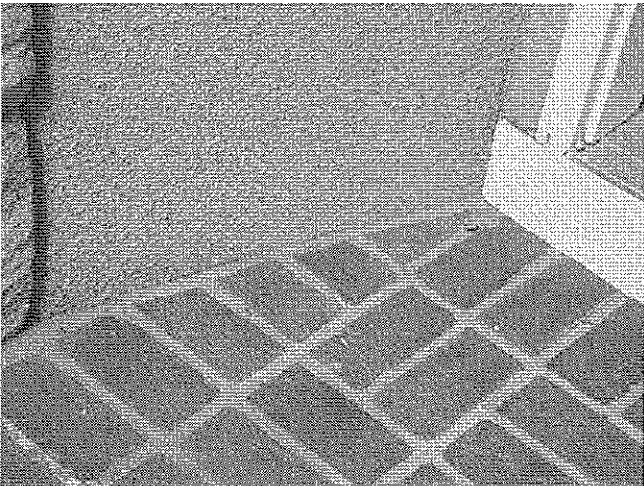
/ Typical cement stucco termination at brick front porch and rear patio.
